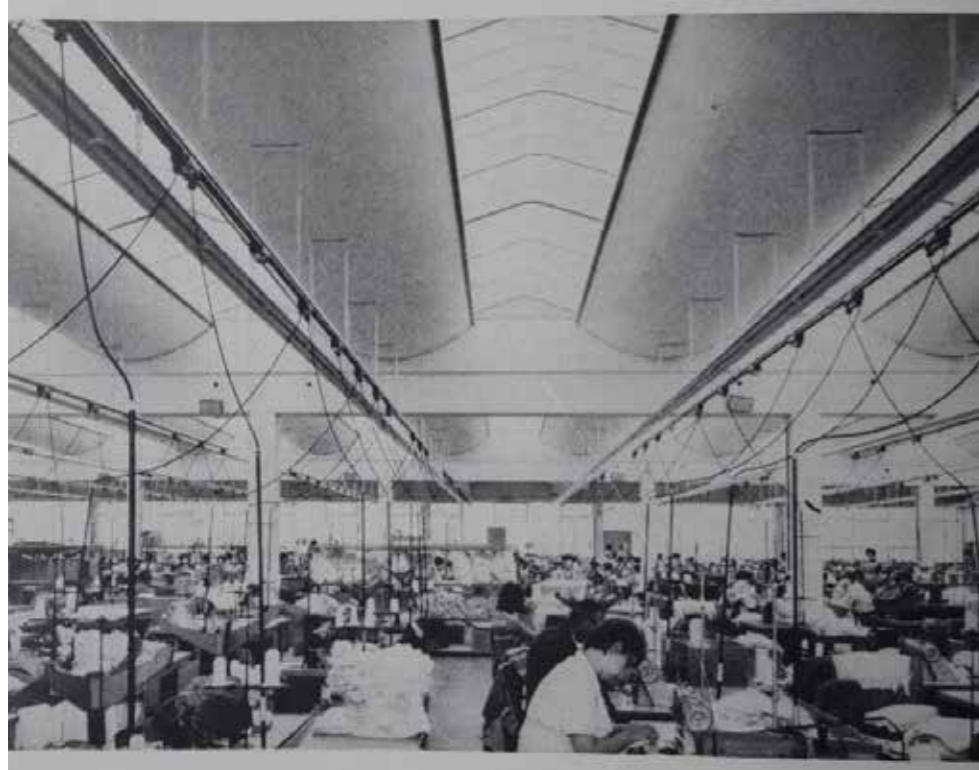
unnamed example. Manual of Precast Concrete Constructions Vol. 2, p. 282
